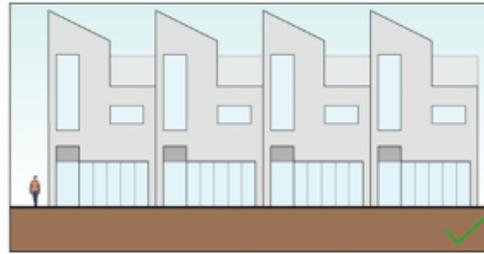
Designing the ground and upper floor uses as an integrated building
